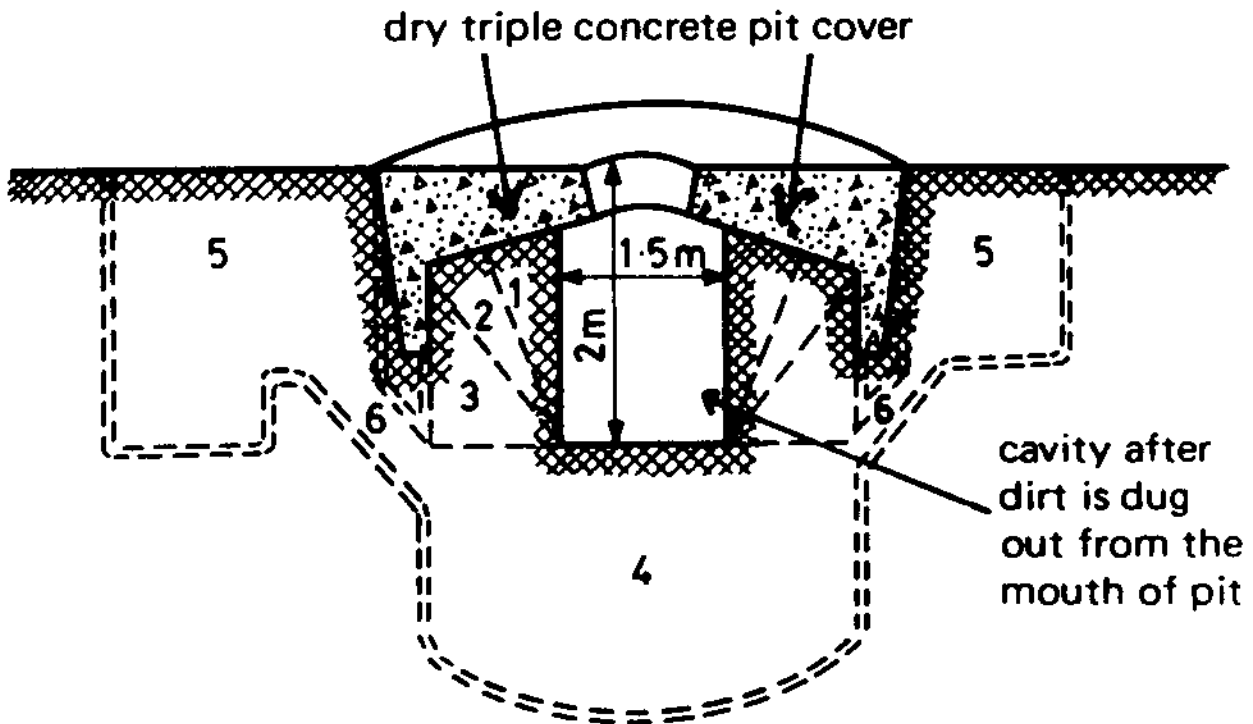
Excavation under the cover. 1-6 describes the order of excavation of the pit: 1, 2 and 3 should be completed before going on to 4, then 5 and lastly to 6 (the connecting passages between the inlet and outlet and the actual pit).
